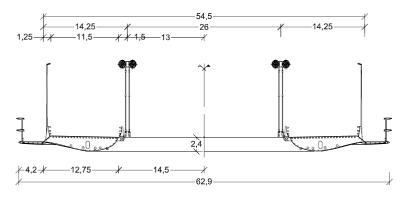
Cross-section of the deck with main suspension cables spaced 26 m apart.
